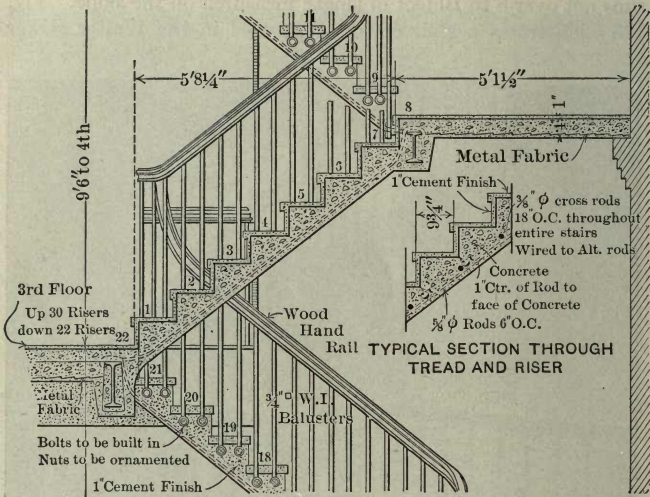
Concrete Stairs, U. S. Assay Office, N. Y.
